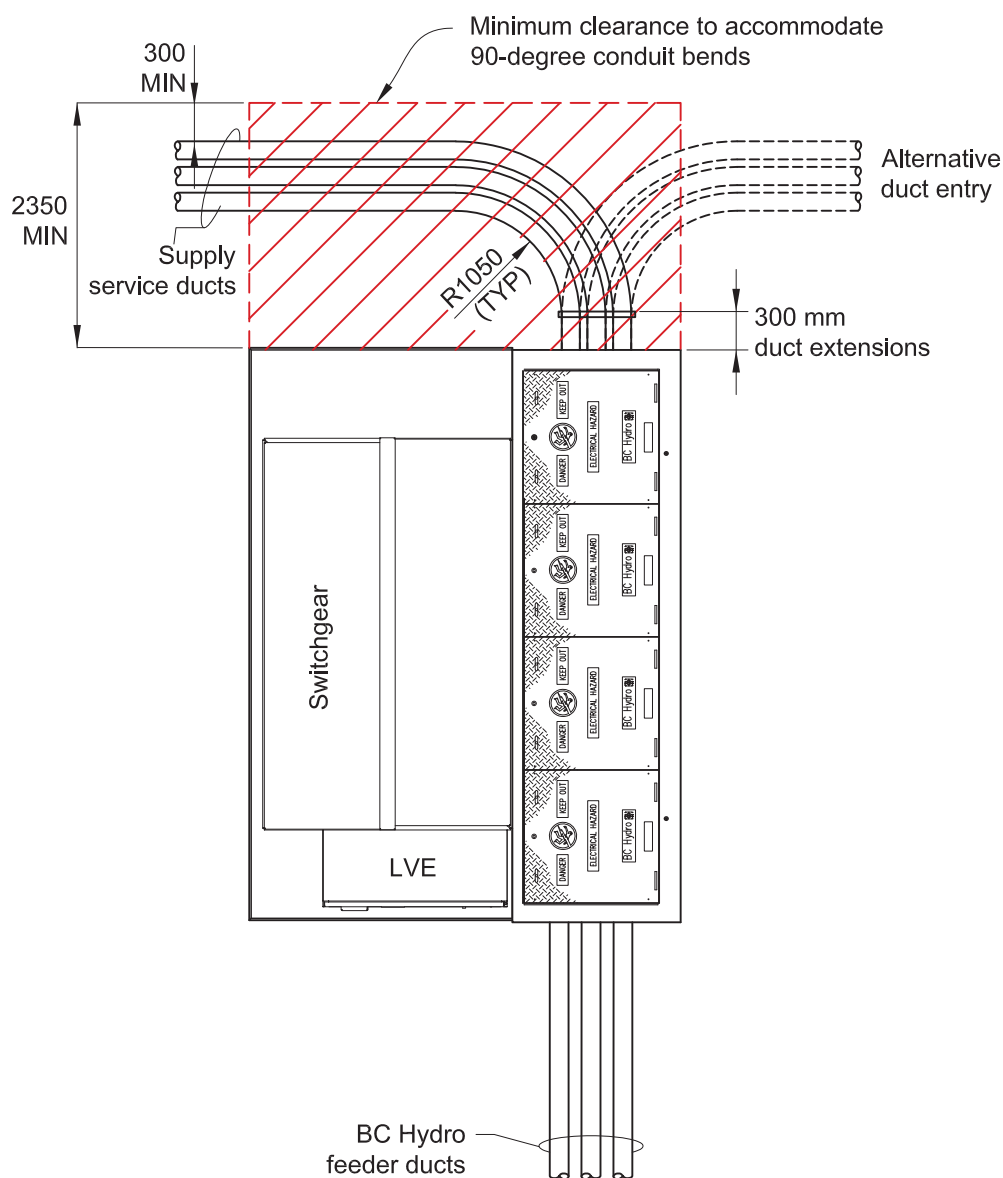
BC Hydro switchgear over-pad duct block diagram and equipment arrangement
